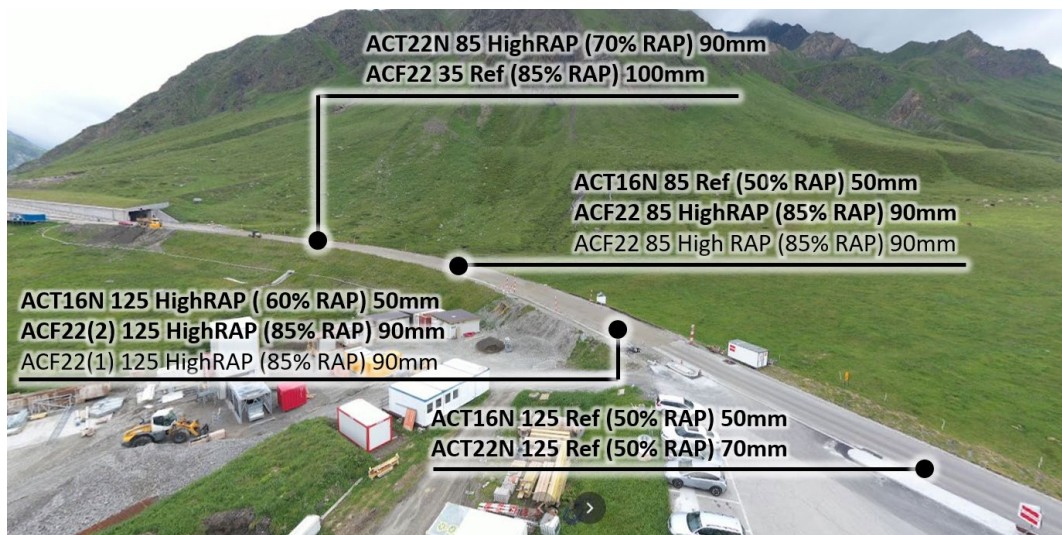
The location of Lukmanierpass test section mixtures. The bold mixtures are a part of the original test program. All mixture and road core samples were taken from the road lane closer to the mountain.
